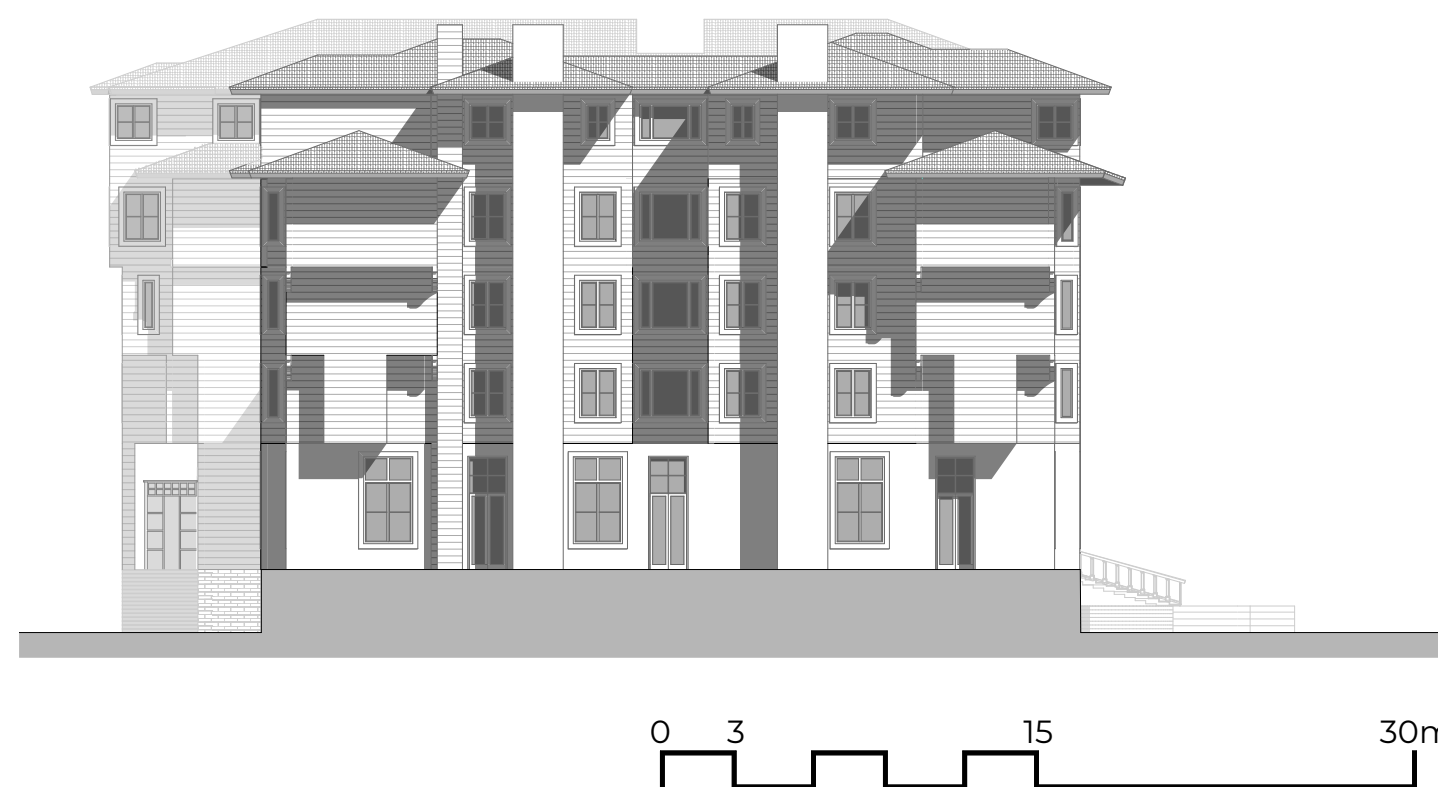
Southwest Elevation (Source: Created by the author, 2024)
